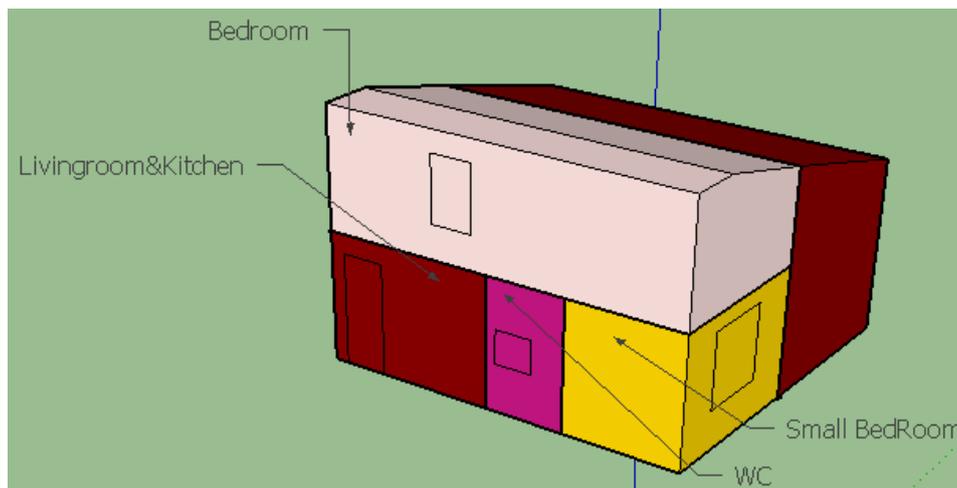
Leaf House 3D Model 2nd floor West Apartment
